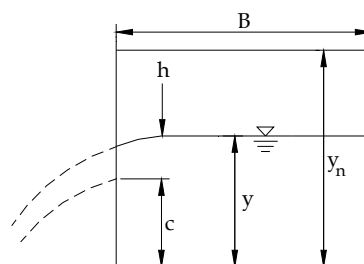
Typical Cross-sectional Hydraulics at a Side-Overflow Weir (Metcalf & Eddy, 1972)
